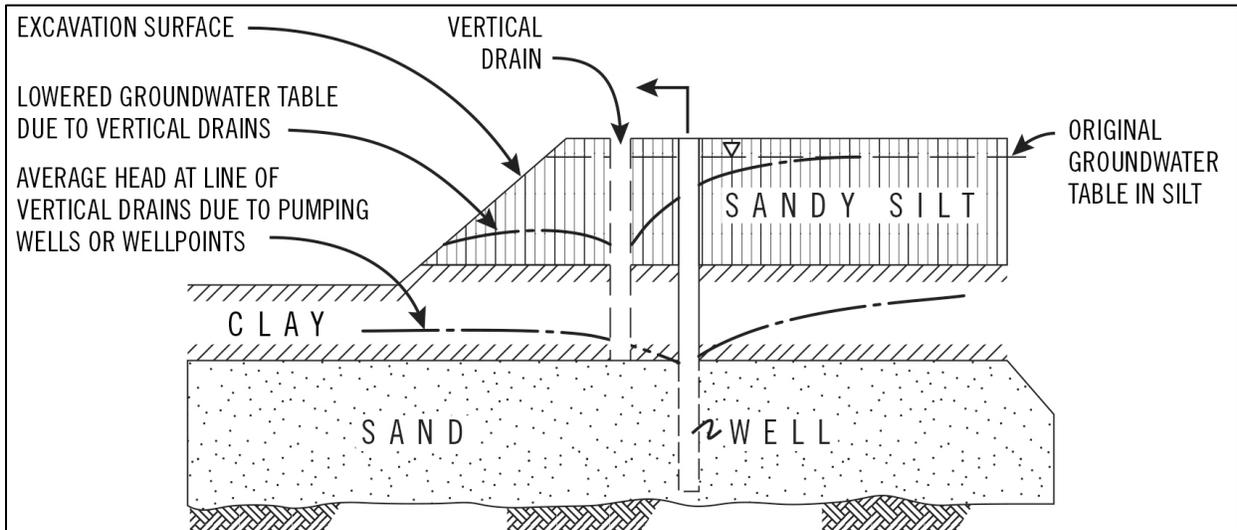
Vertical drains for dewatering a slope (Adapted from TM 5-818-5)
